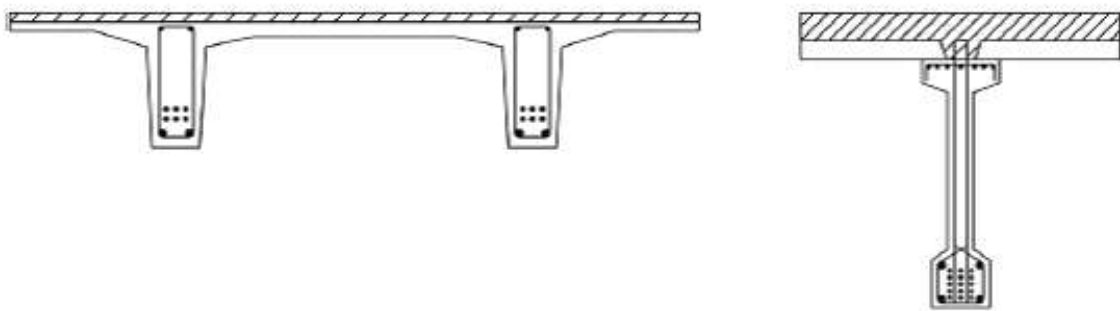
Examples of composite element cross sections [Halicka, 2007]
